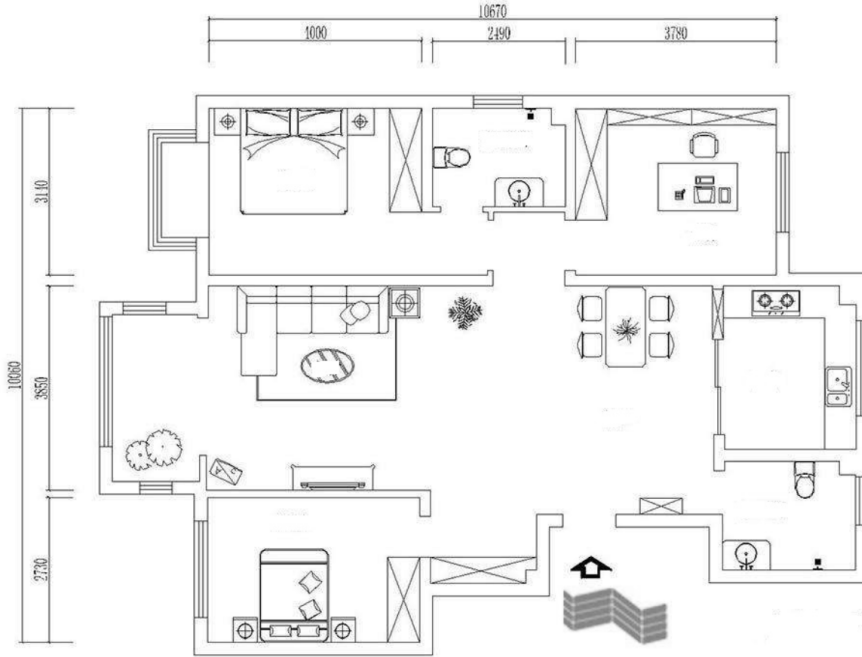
The standard house of No. 1 building of Laiwu Iron and steel garden
